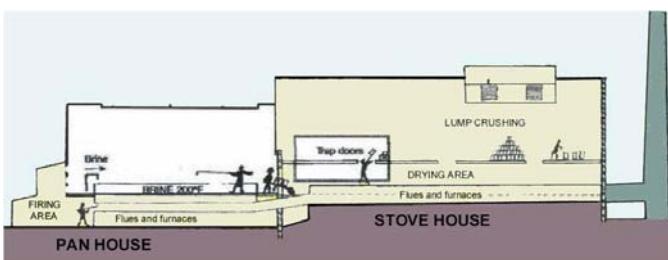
Section through a Lion Salt Works Pan House and Stove House
